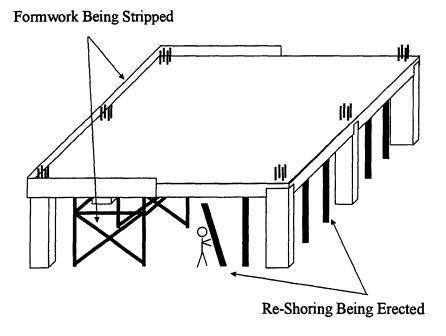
Stripping of Formwork & Erection of Re-Shoring
